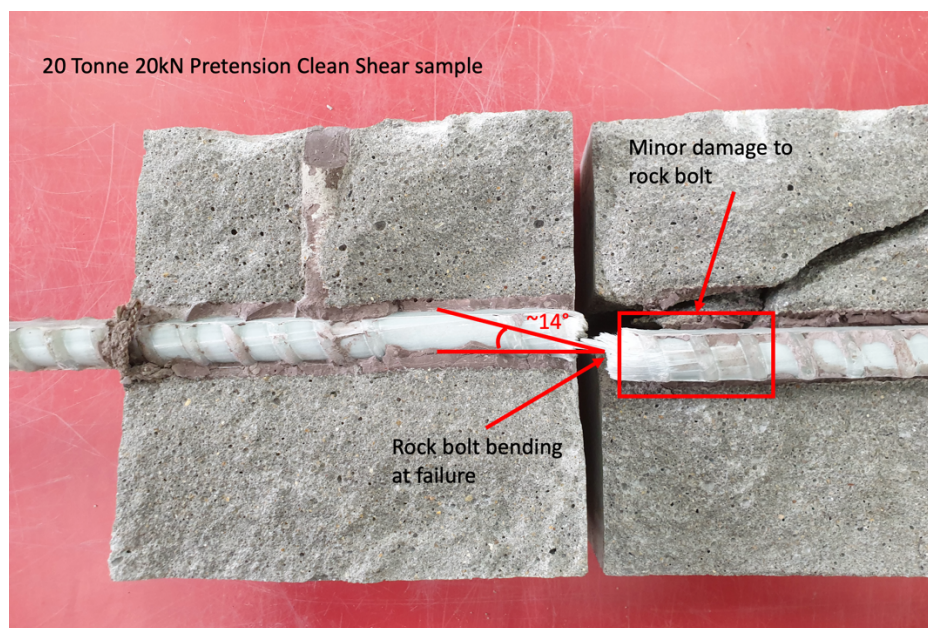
Angle of failure and rock bolt damage for 20-tonne 20kN pretension clean shear rock bolt
